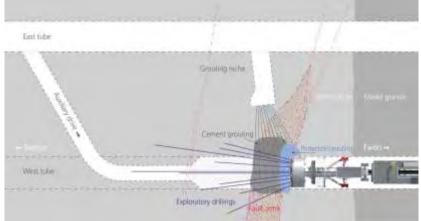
Gotthard Base Tunnel, Section Faido, grouting of a fault zone in the western tube
